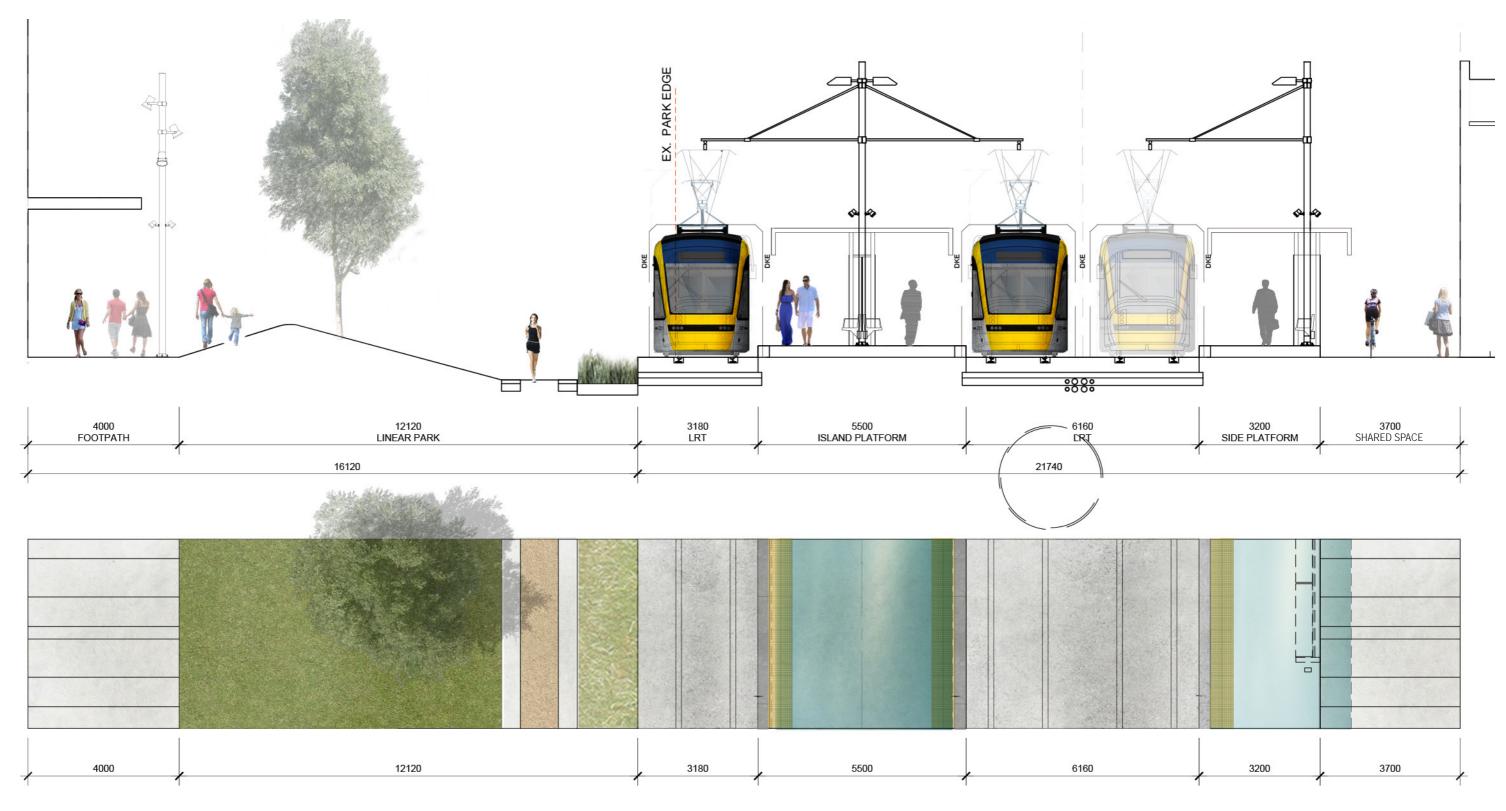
Partial plan and section of Jellicoe Street Terminus looking north
